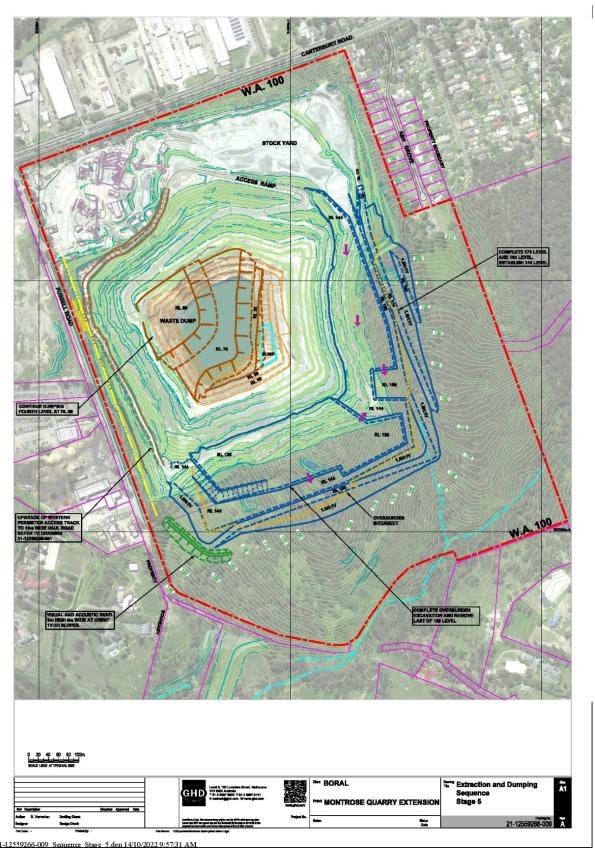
Proposed Expanded Pit – Stage 5 (source GHD)
